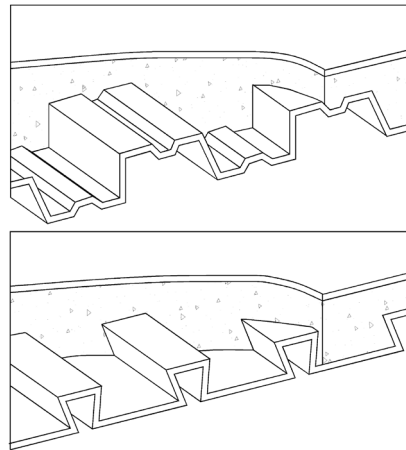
Trapezoidal and re-entrant composite slab with steel deck.
